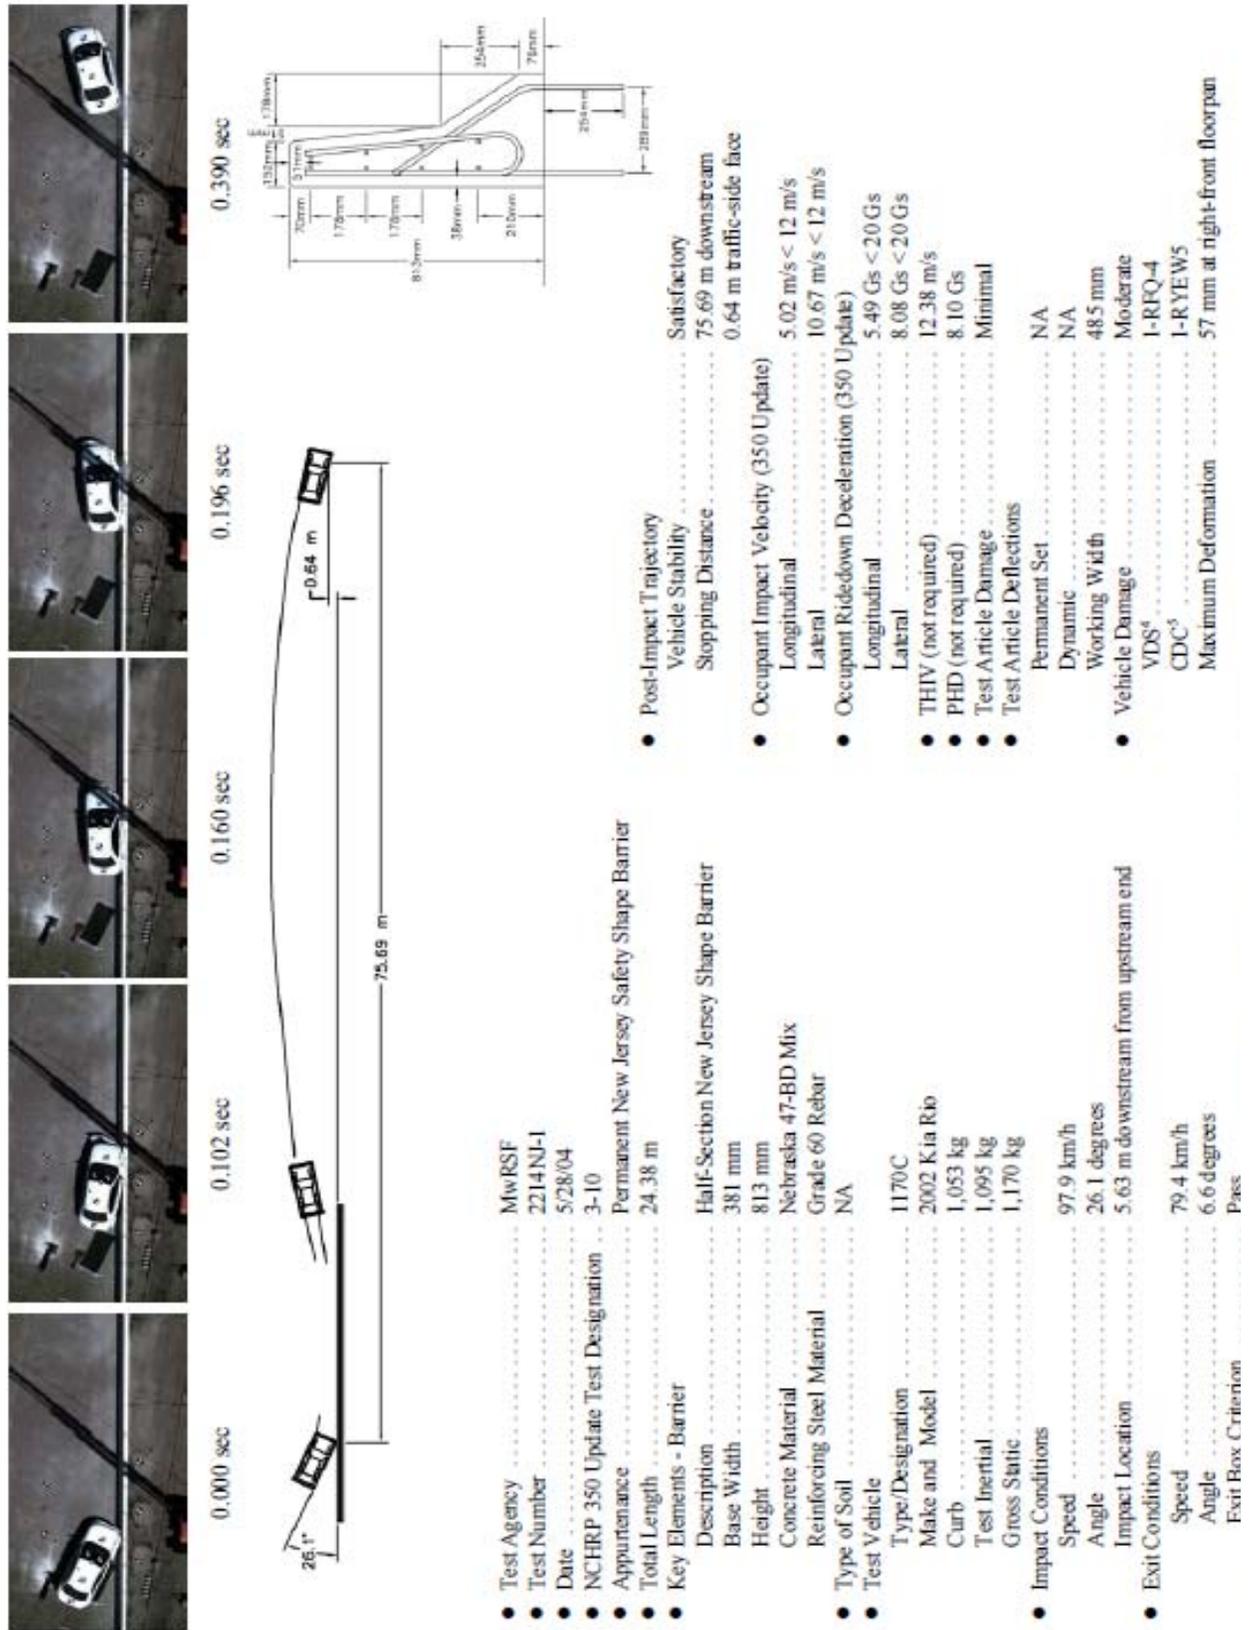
Full-Scale Test Summary for Small Car Impacting the Concrete Barrier [3]
